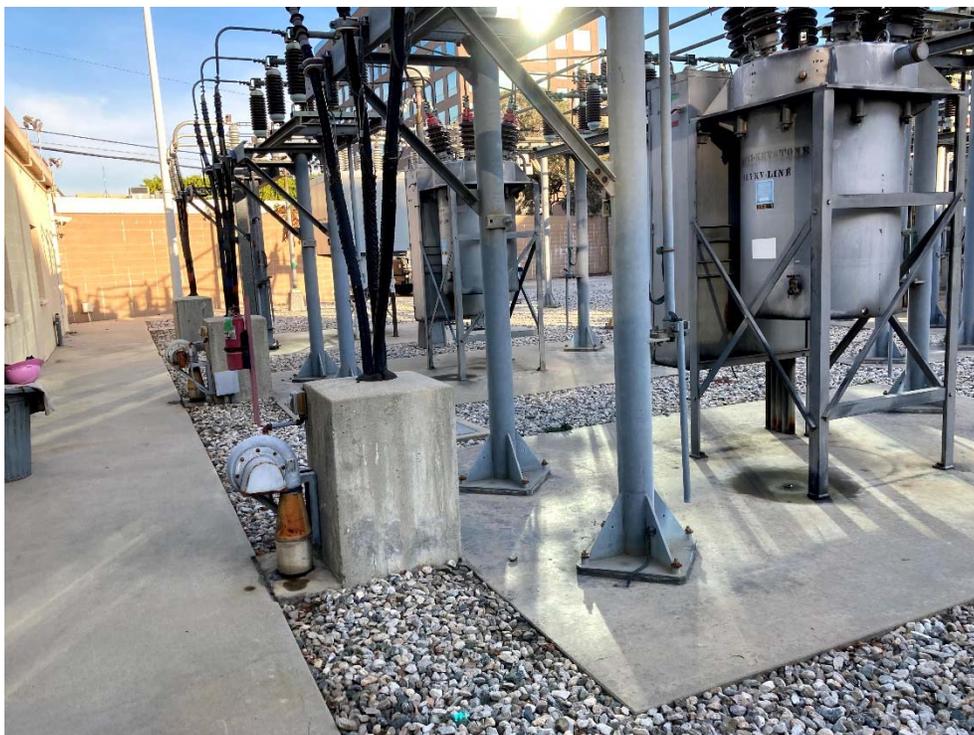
Water staining from condensation was below some of the equipment. The view is to the north from the southwestern corner.
